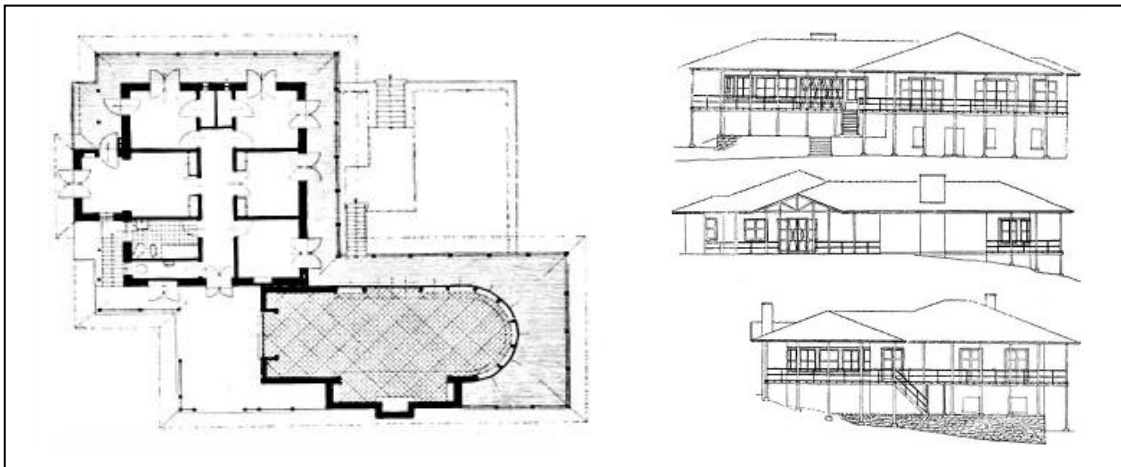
Floor plan and facade appearances of Fethi Okyar vineyard house
